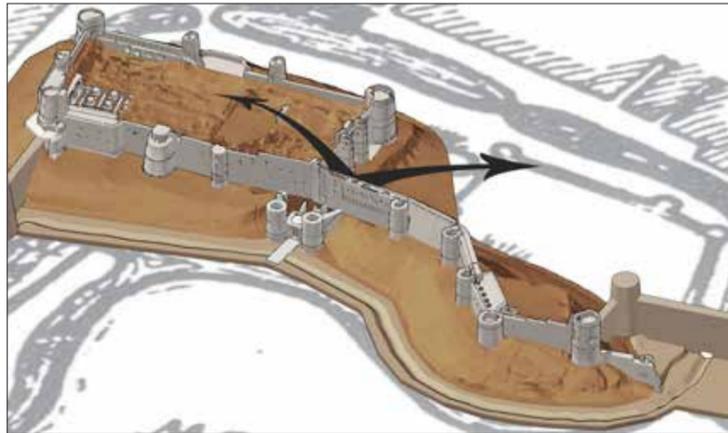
Isometrical view of the Timurid gateway and the layout of the citadel walls at Architectural Phase 1 (schematic, the architectural details correspond to today's appearance), view from northwest
